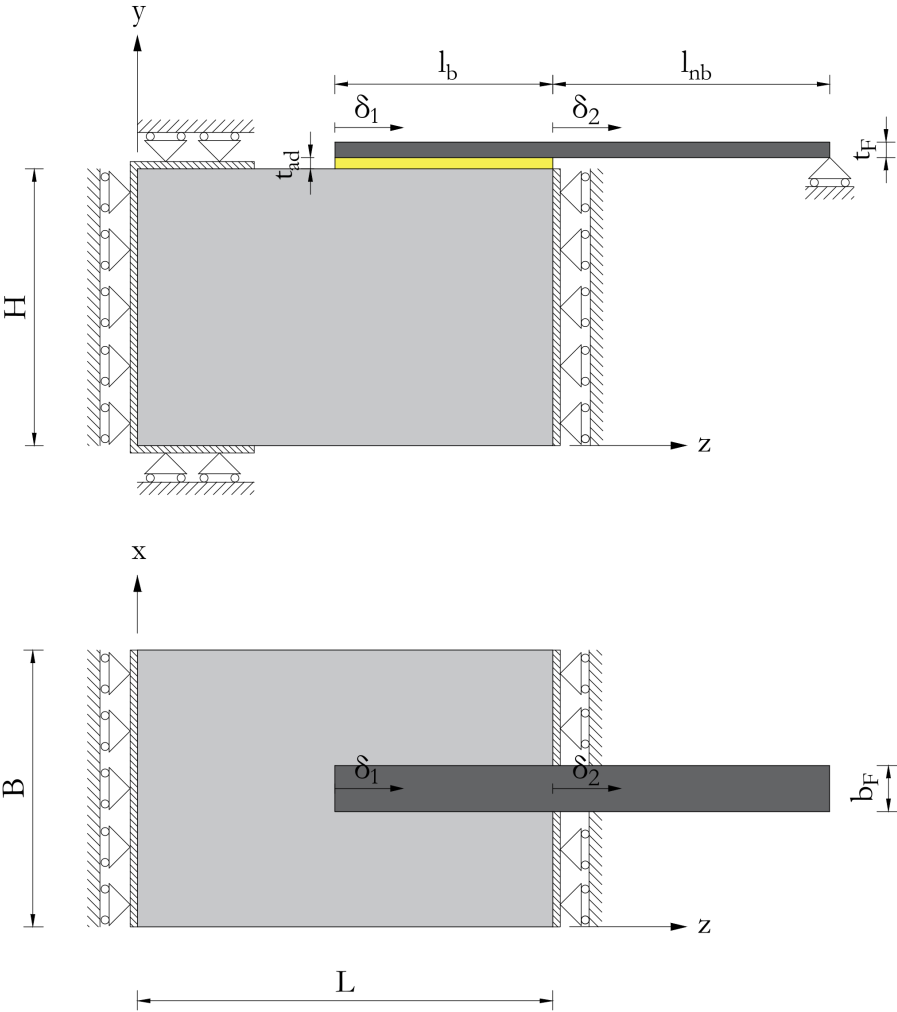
Geometry of the specimen used for the single-lap shear test carried out by Chajes et al. [96].
